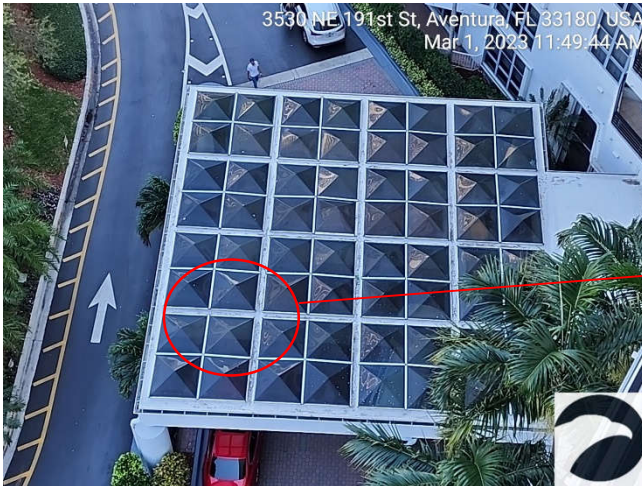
Existing skylight roofing system in fair condition (Lower Roof)
